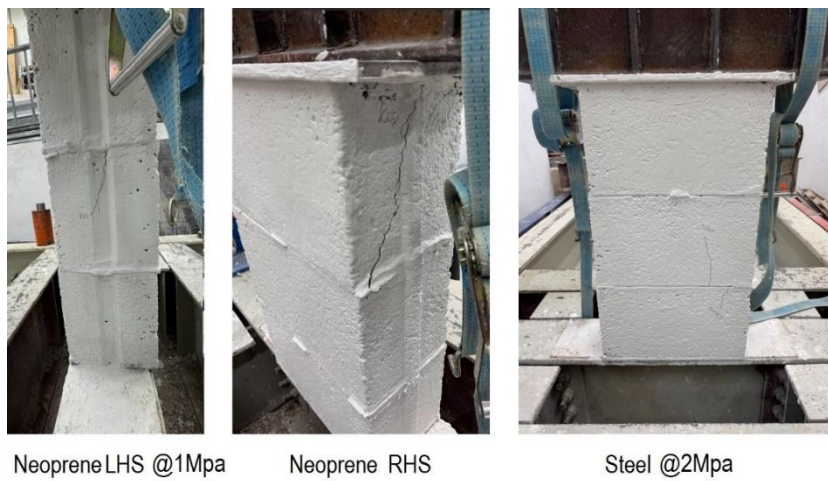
Initial Cracking of Neoprene and Steel Transverse Full Wallettes
